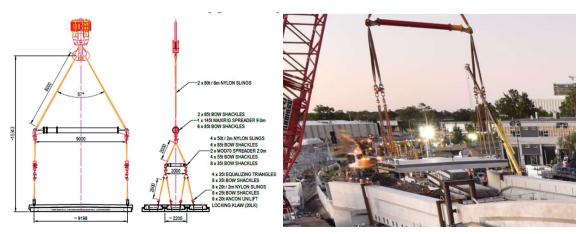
Rigging arrangement of 3 plank 90 t lift on the drawings and in photo on site.
